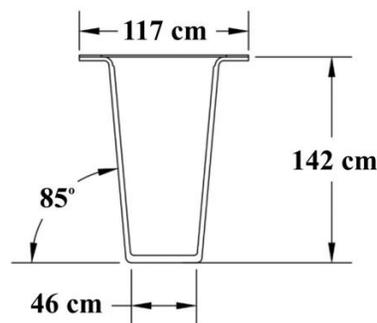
Cross section of the preliminary design for the CT girder from AIT Bridges.
